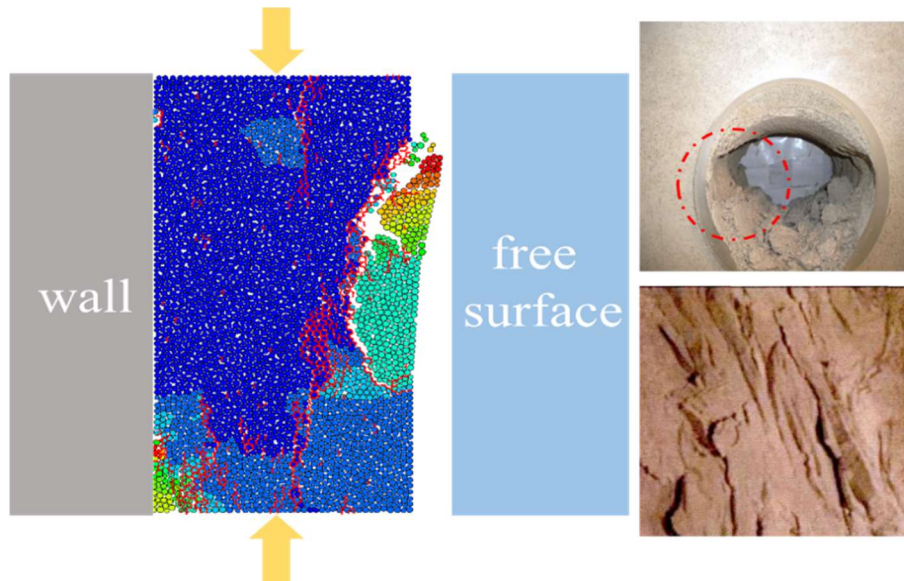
Comparison of actual sidewall failure [1,7] and specimen failure
